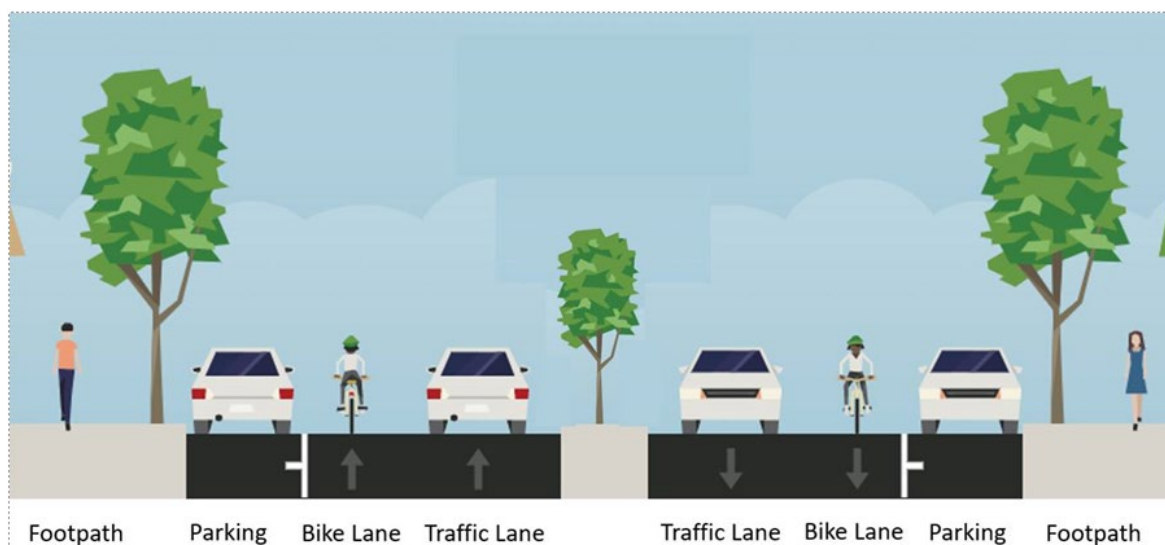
Existing layout on Inkerman Street from St Kilda Road to Hotham Street.
